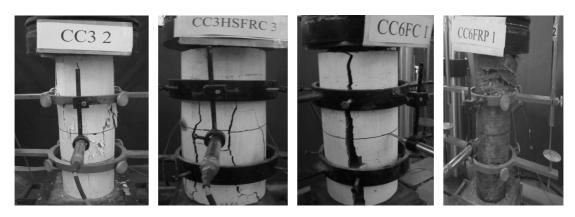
Failure pattern of heat damaged cylinder and strengthened specimens
